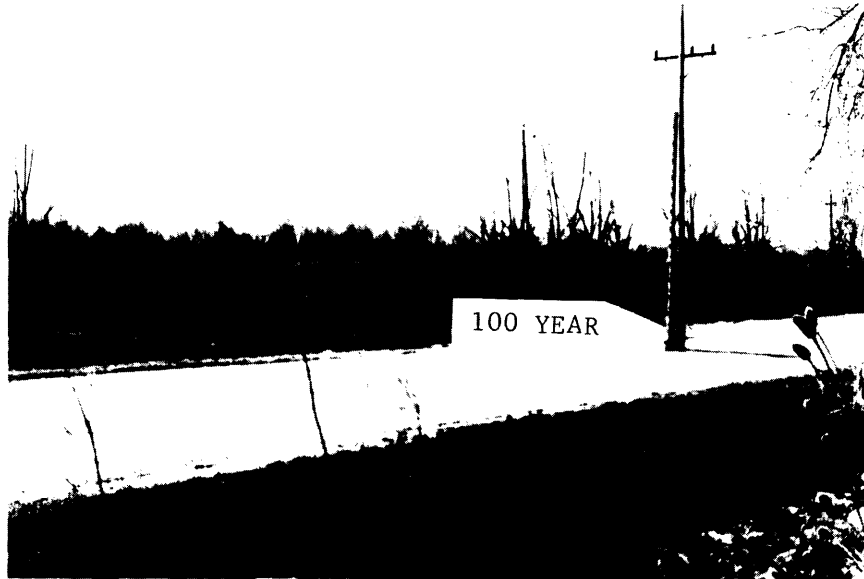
At River Road, Town of Leicester, projected 100-year flood elevation on Tributary to Beards Creek. (The 500-year flood elevation would be 0.1 foot higher than the 100-year).
